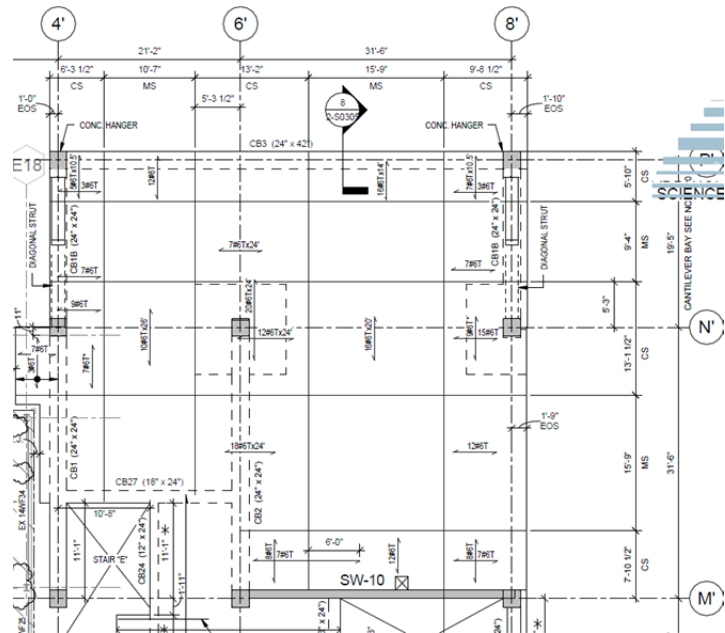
TYPICAL FRAMING PLAN SHOWING COLUMN D-6
